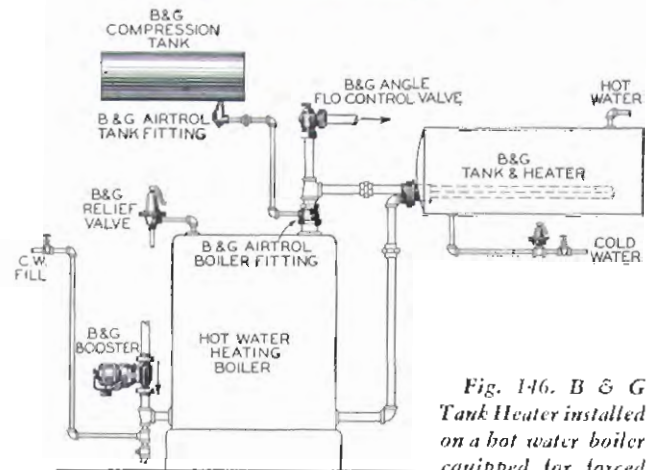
B & G Tank Heater installed on a hot water boiler equipped for forced circulation and year around domestic hot water supply.
